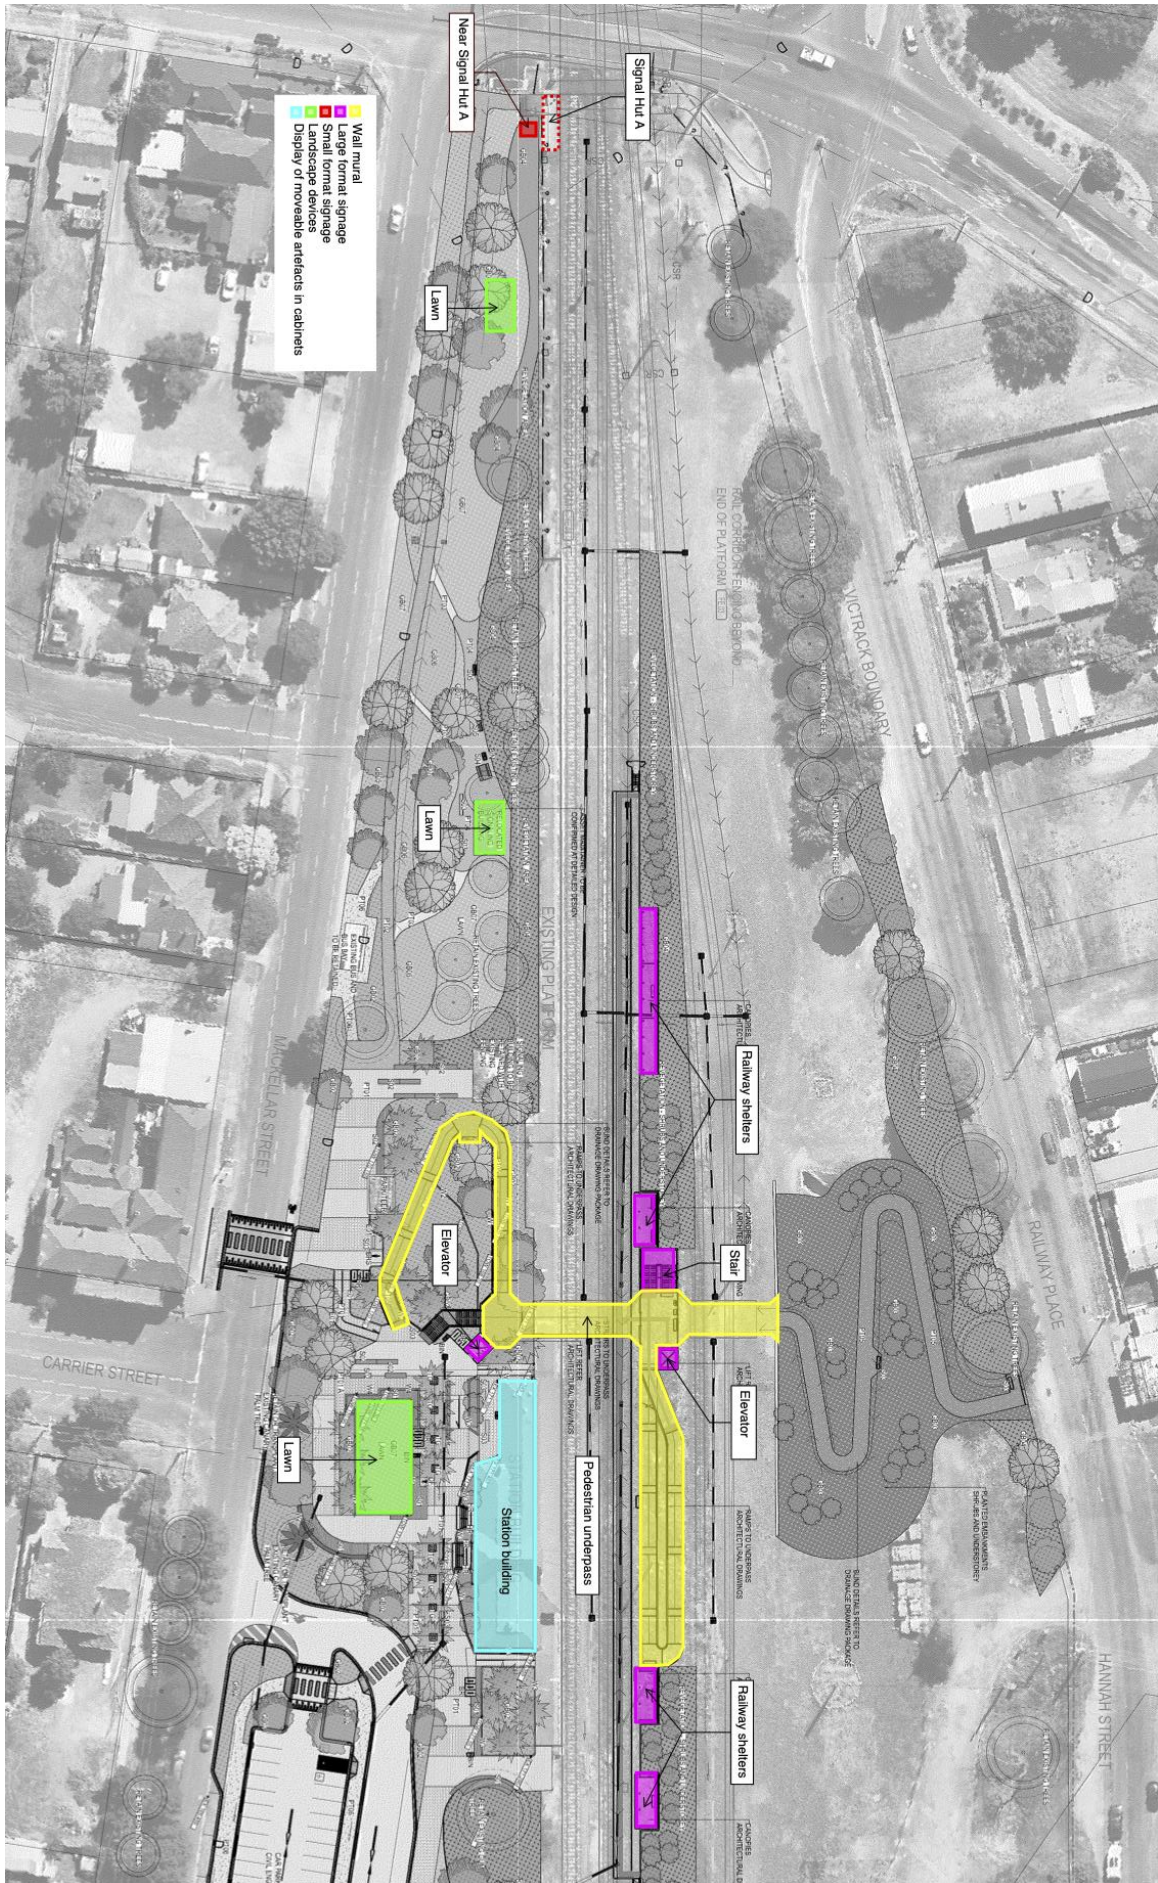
Proposed interpretation location plan for the new Benalla Railway Station Precinct.
